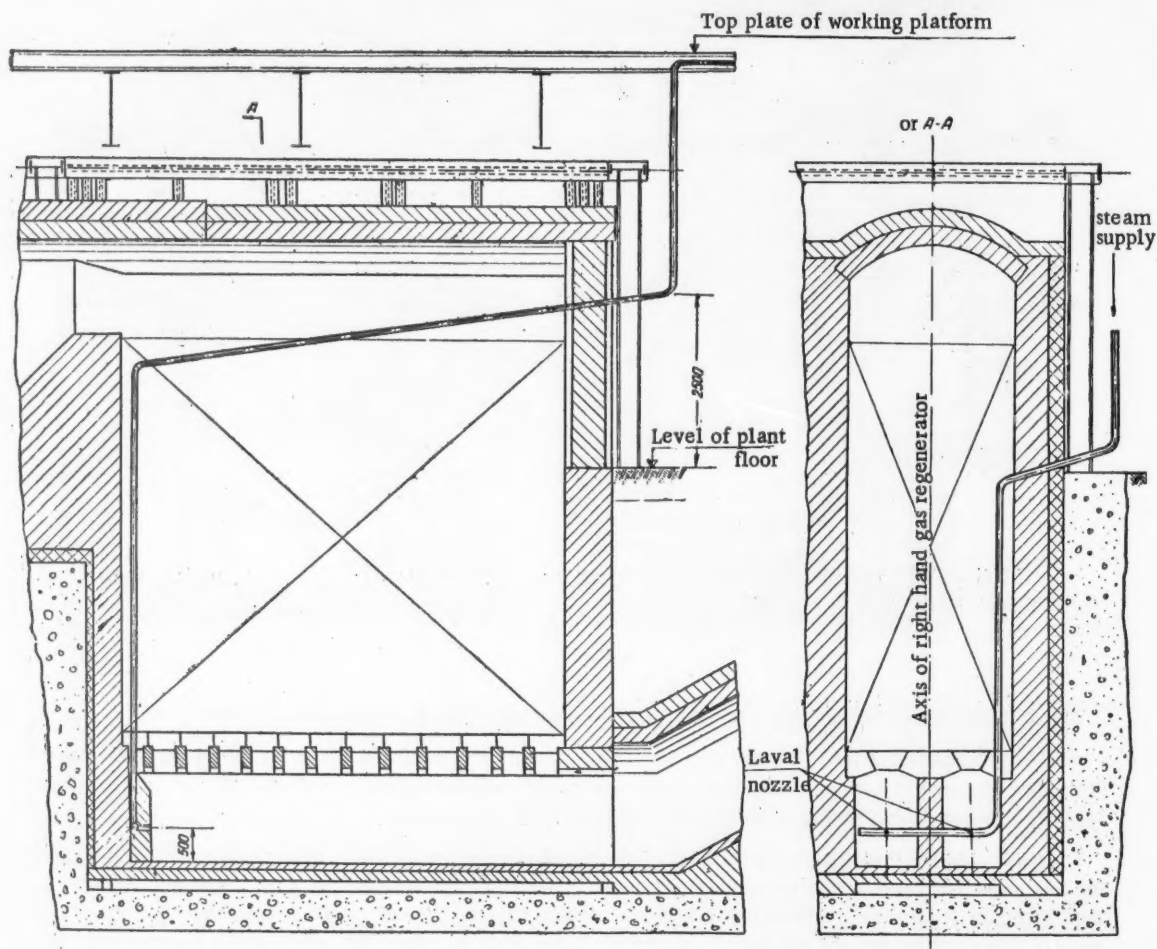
General view showing steam supply for blowing dust out of the checker flues of an open-hearth furnace.
